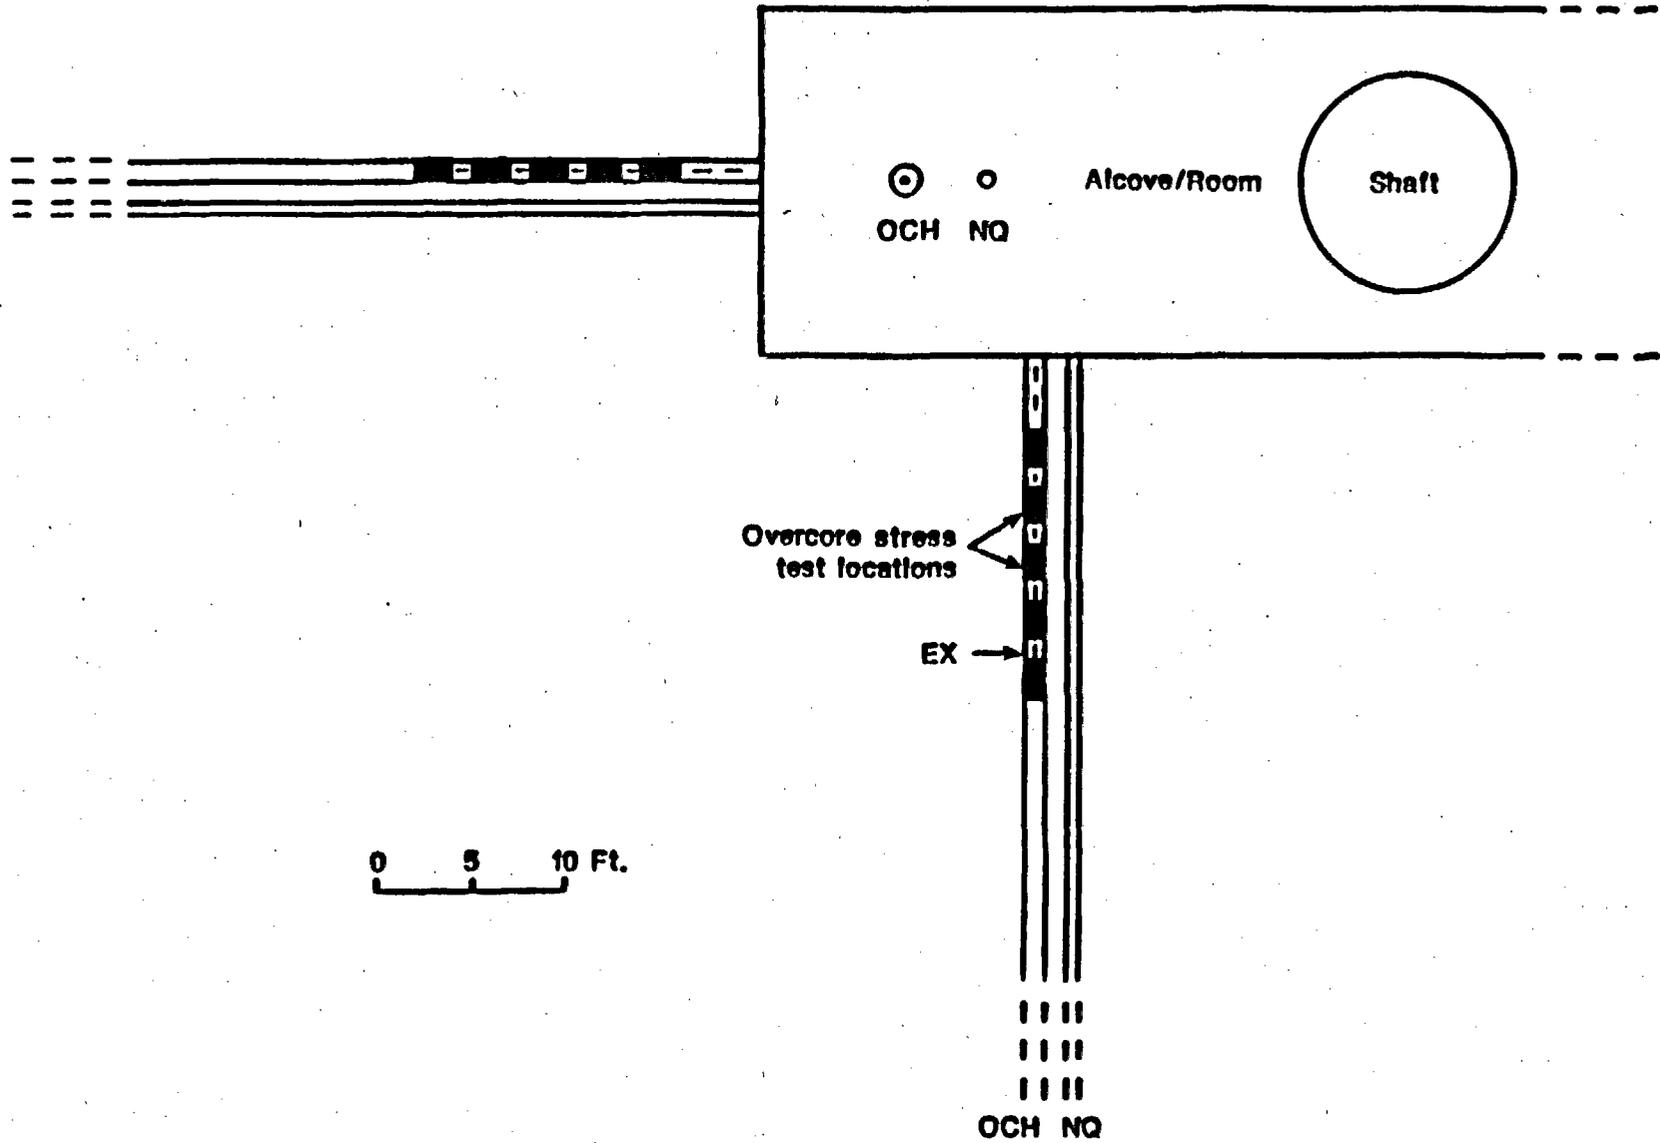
Schematic plan view of layout for overcore stress tests in the breakout rooms and in the alcove near the base of the exploratory shaft, showing typical locations of exploratory (NQ) and adjacent, parallel overcore (OCH) holes surrounding pilot (EX) holes.
